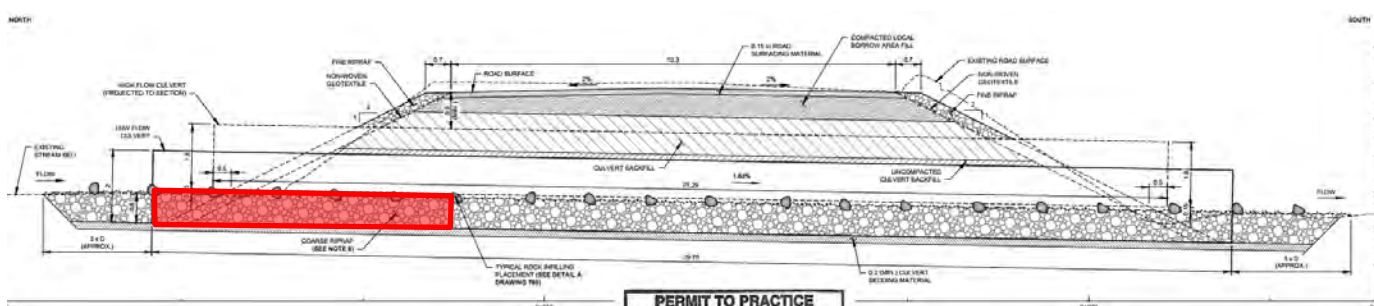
Approximate area of placed Culvert Infill Material containing snow at BG-04 Culvert shown in red (From Drawing 745 R2)
